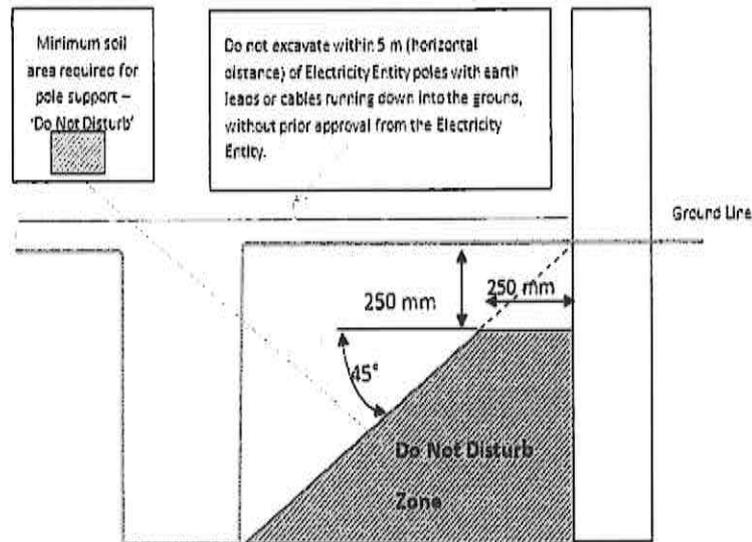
Do Not Disturb Zone requirements when excavating near poles
